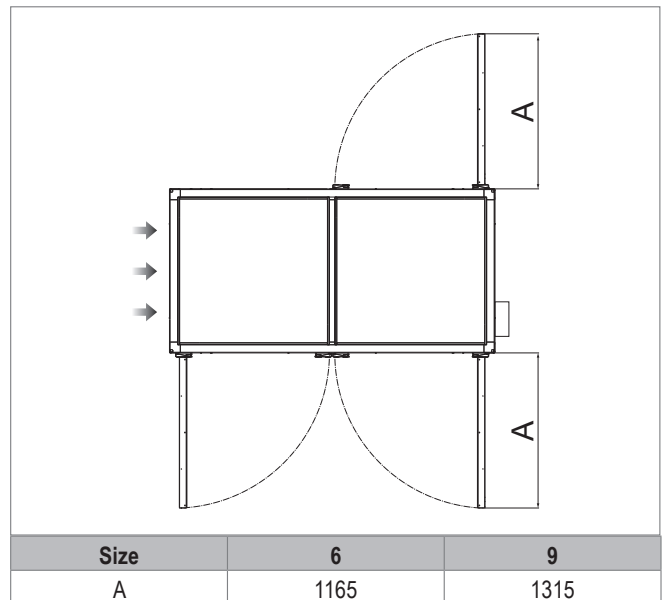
Space requirements for opening the access doors (dimensions in mm)
